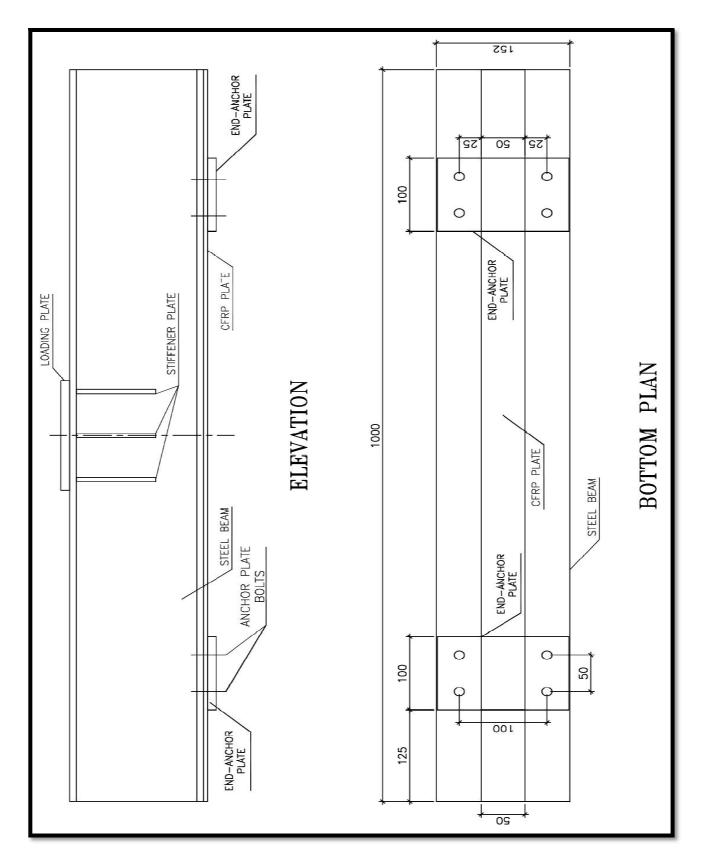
Details of Strengthened Test Beams with End Anchorage. (Beam 3, Beam 7, Beam 8 and Beam 9)
